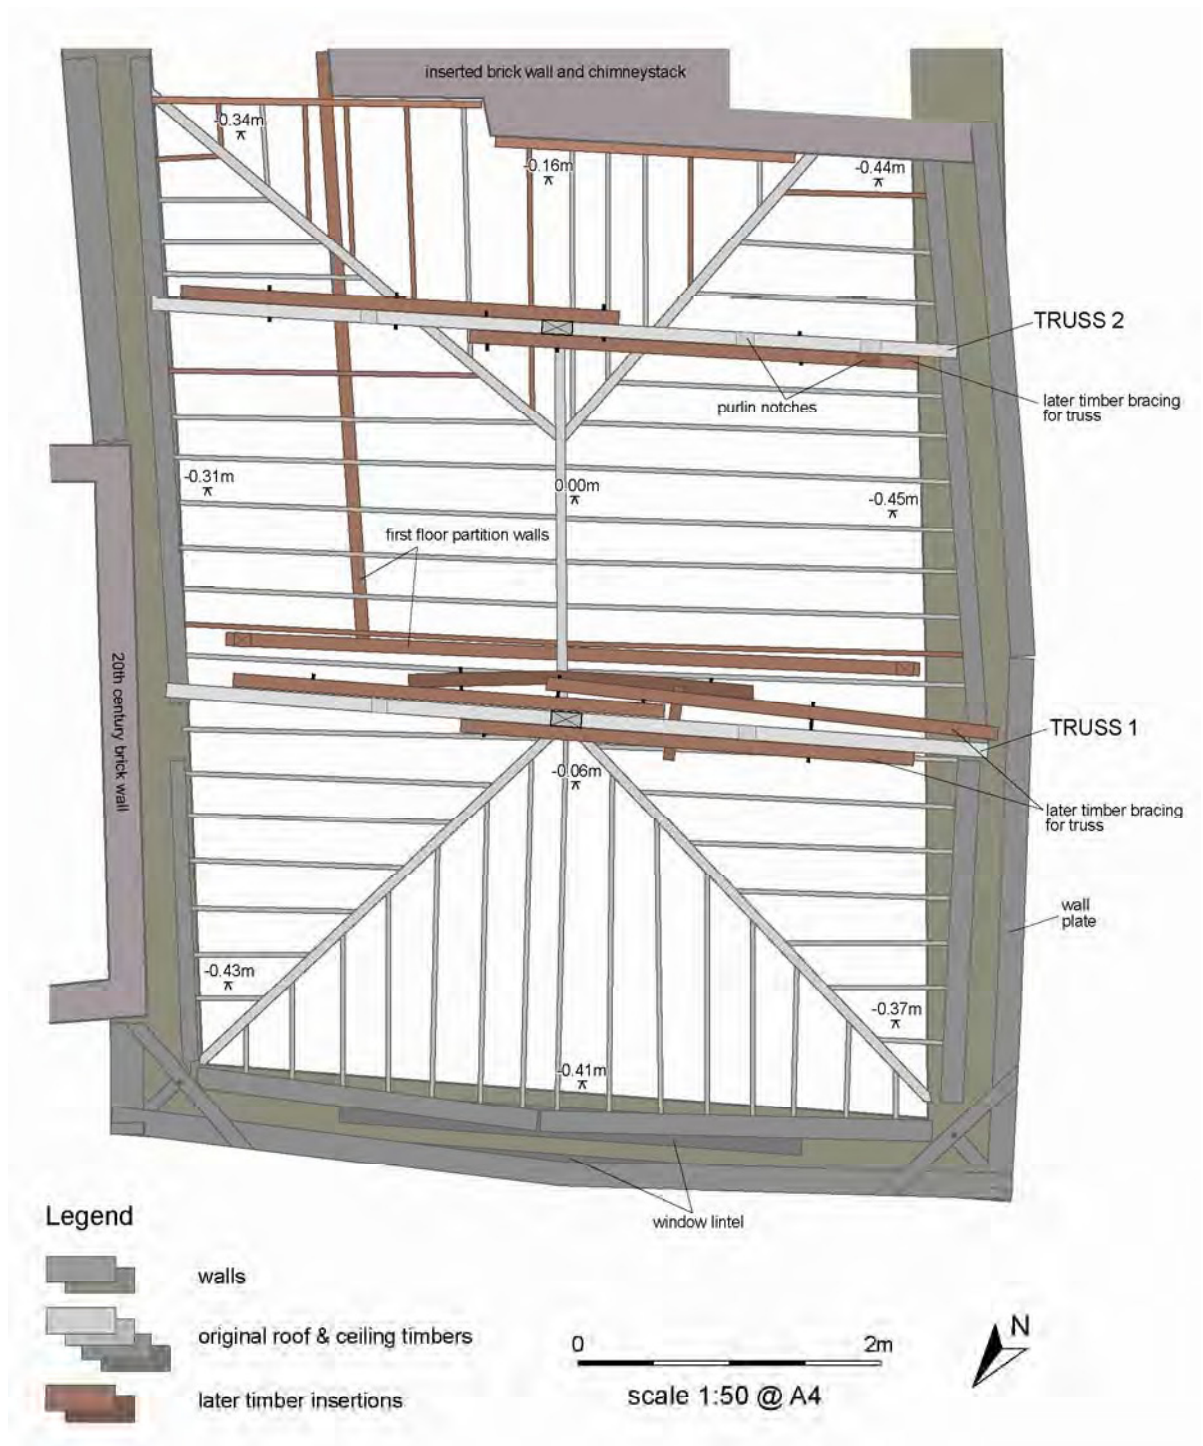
Plan of the roof structure and trusses at Fishleigh House.
